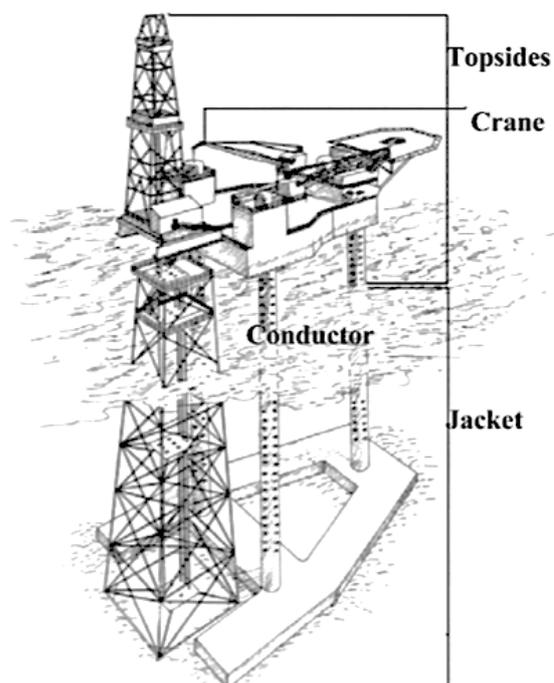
Graphic sketch of a steel jacketed platform* (Lakhal et al., 2009).
